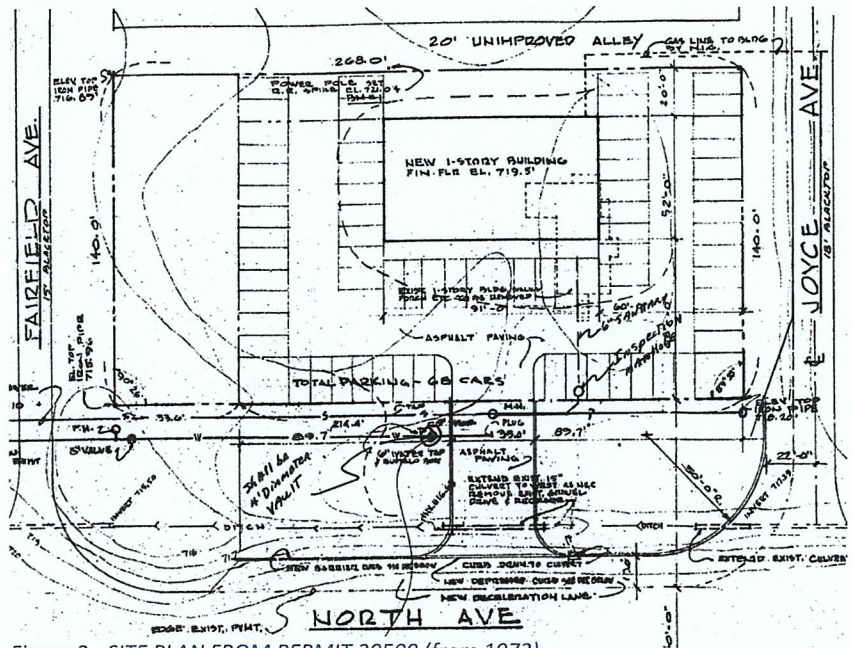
SITE PLAN FROM PERMIT 20500 (from 1972)
